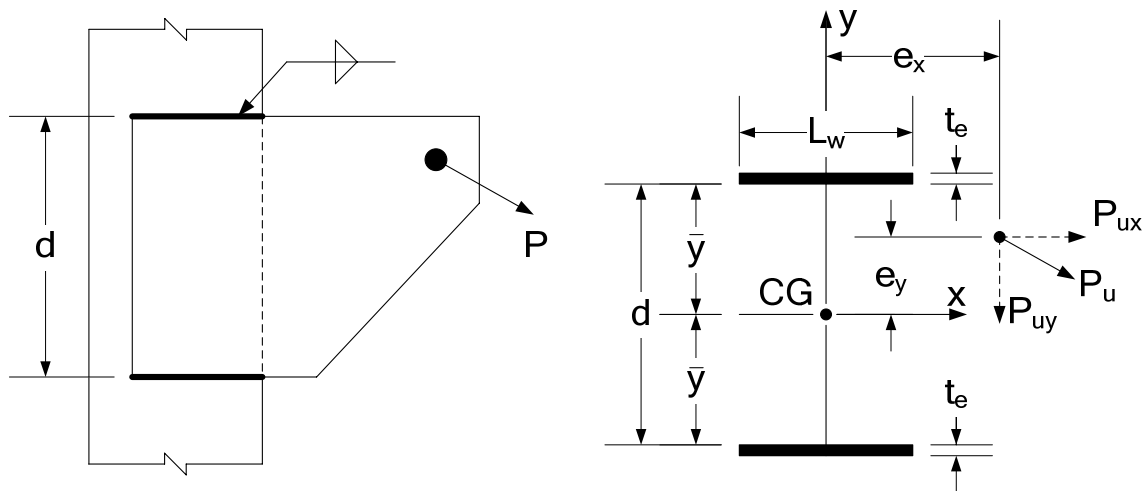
Eccentrically Loaded Fillet Welded Connection Subject to Combined Shear & Torsion
